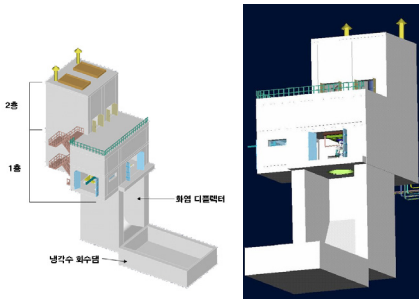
3D Modelling of Test Stand for Rocket Engine Ground Test Facility(ReTF)
